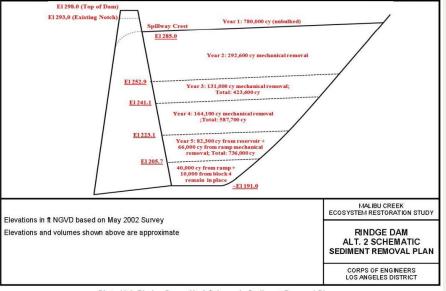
Rindge Dam - Alt. 2 Schematic Sediment Removal Plan
